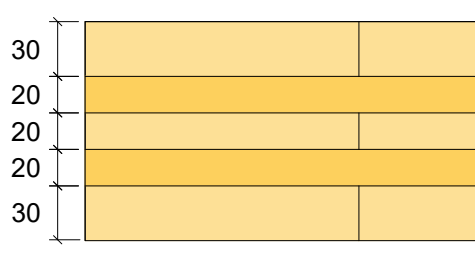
Illustration of the layer height of the test specimen. Dimensions in mm.
